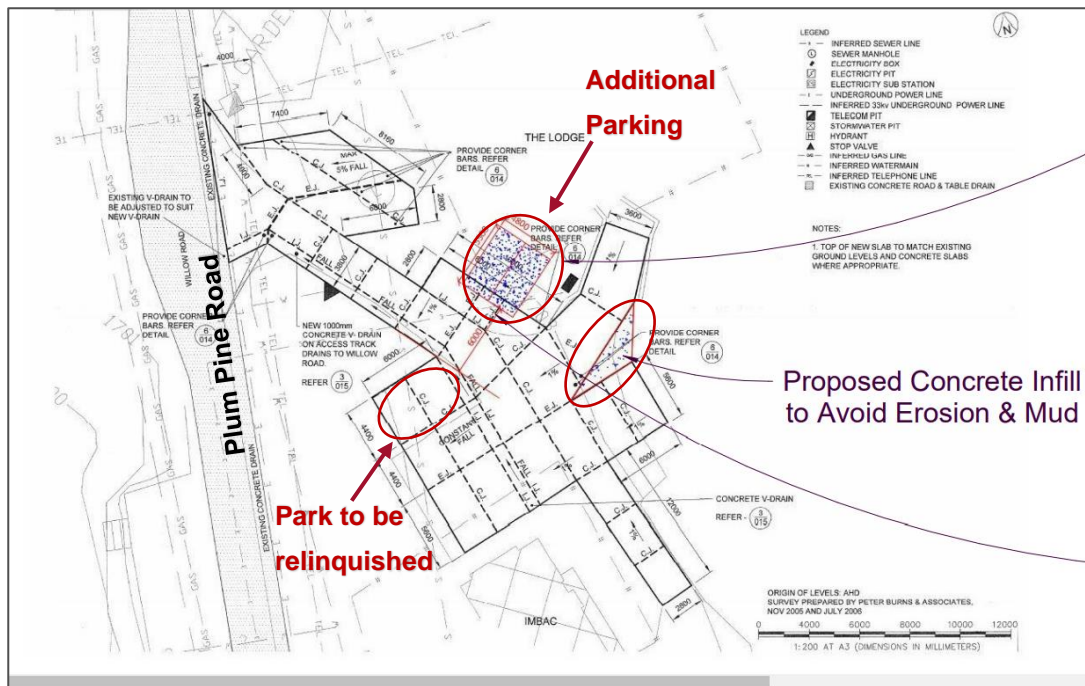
| Location of additional parking and infill space (Source: Applicant's documentation, notation added)
